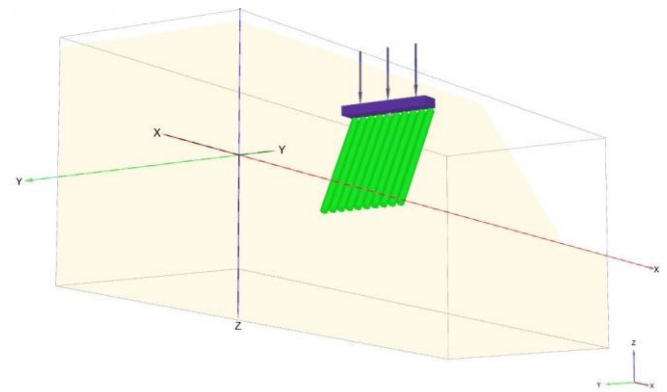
Three-dimensional solid-element model used for verification of the embedded beam approach (soil-cement columns with 30° inclination and 2 m spacing)
